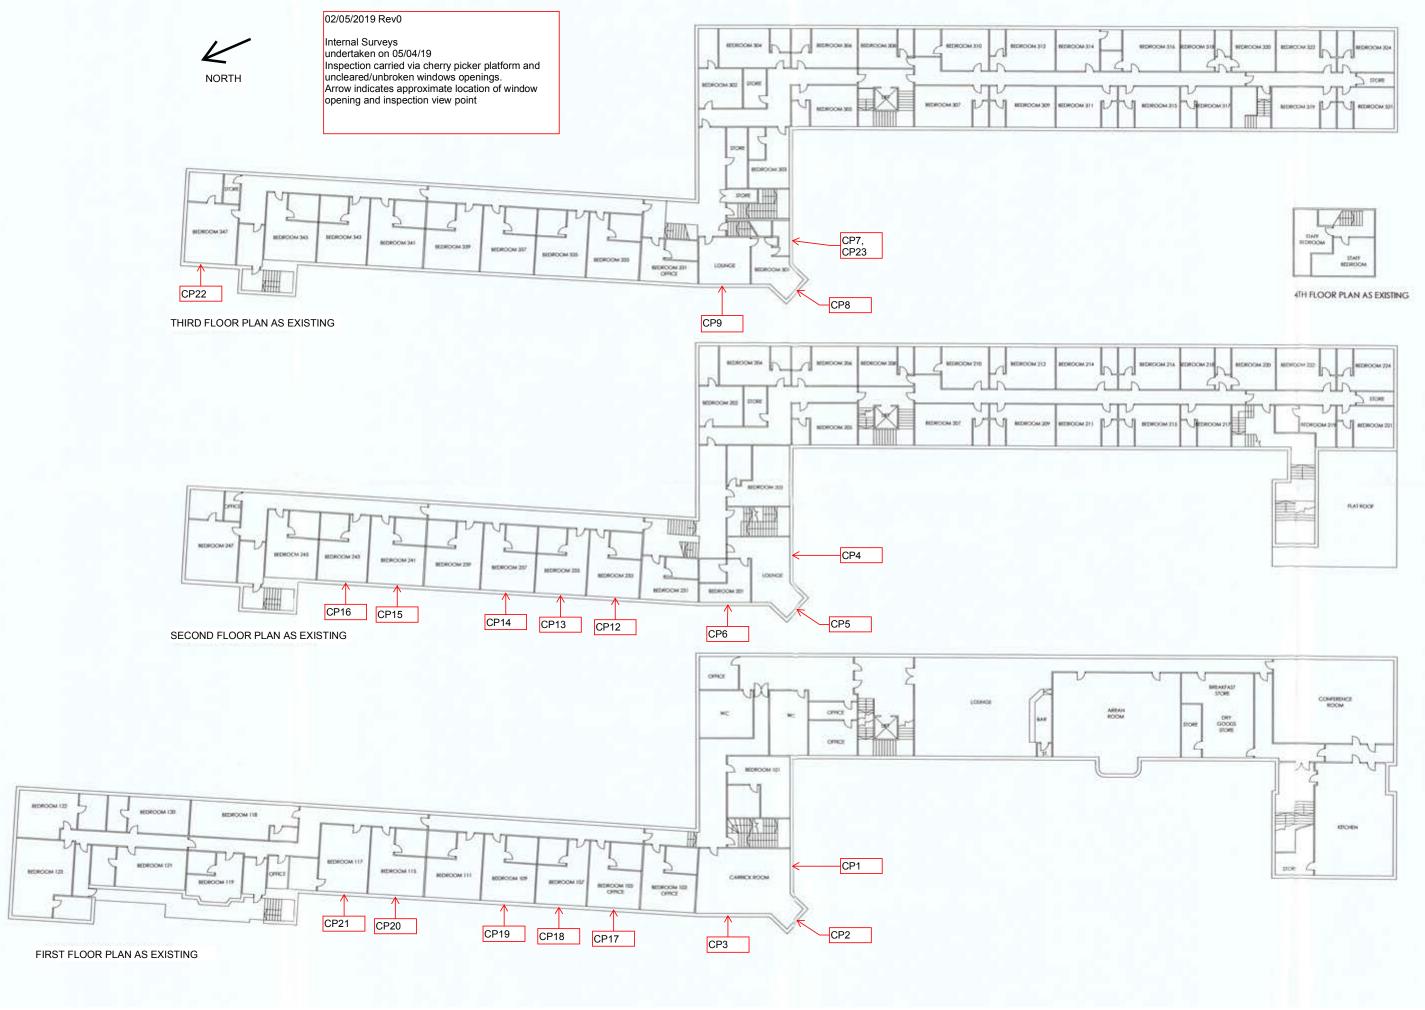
Plan of Station Hotel Building North Block 1st Floor, 2nd Floor and 3rd Floor/Mansard Roof showing Internal Survey (via cherry picker) Defect/Observation Locations
